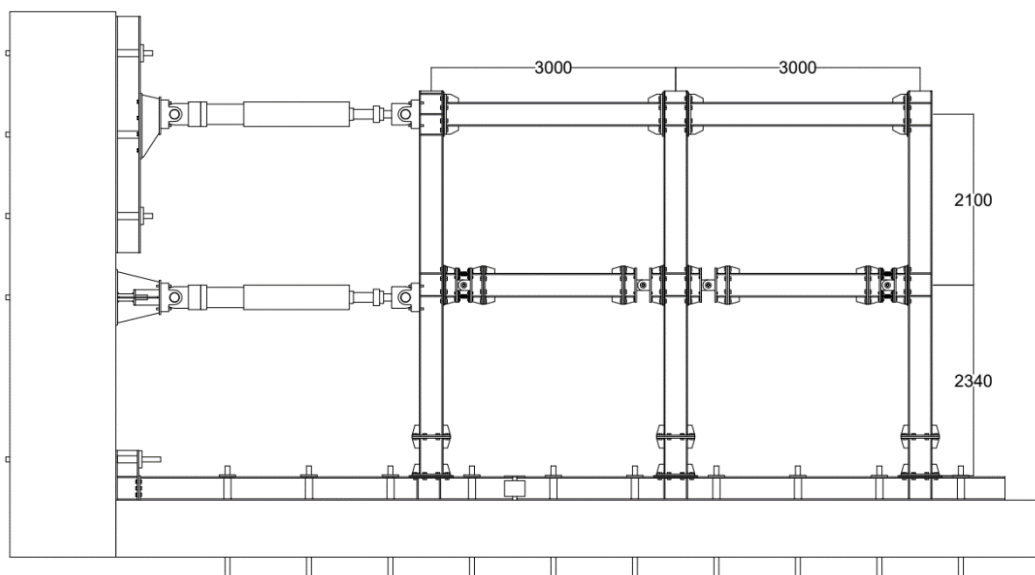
Elevation view of FT3 frame. Dimensions in mm.
